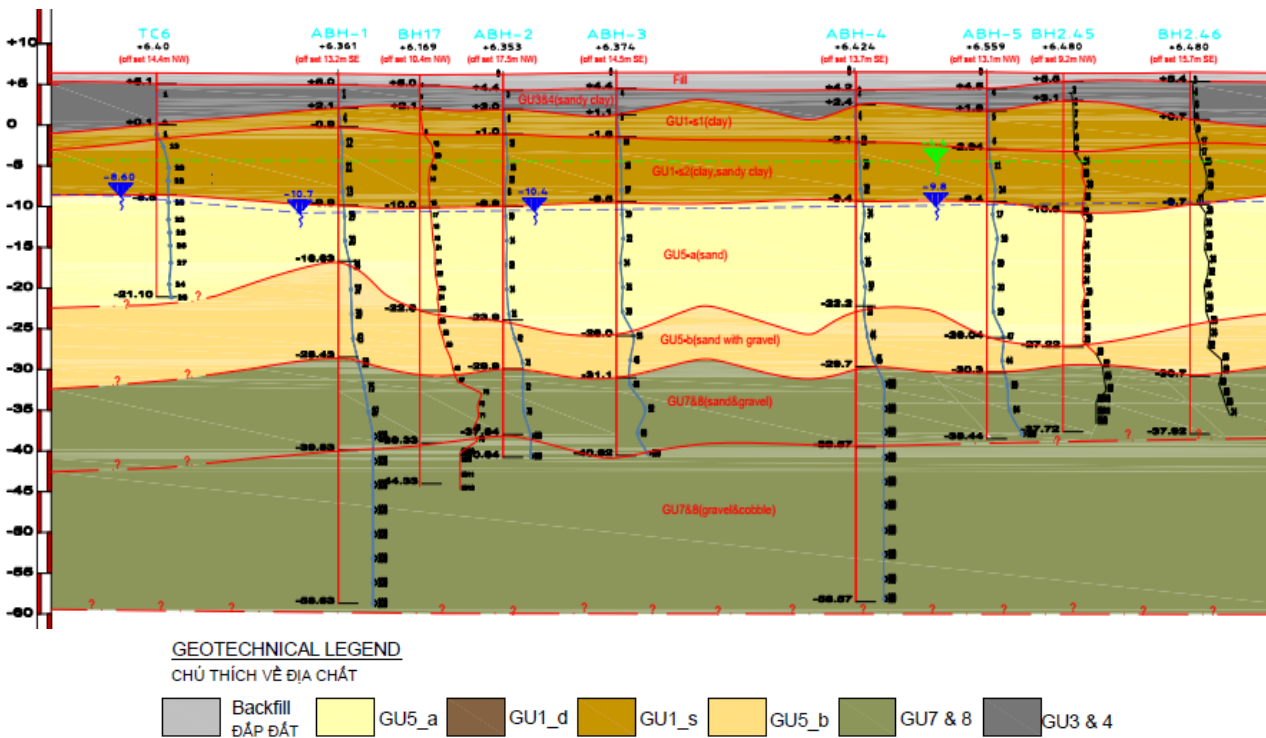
geology at the construction site Ha Noi metro pilot 3
